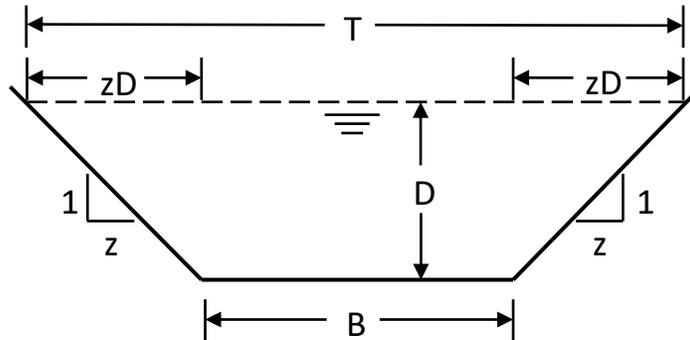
Typical Trapezoidal Cross-Section of an Open Channel
